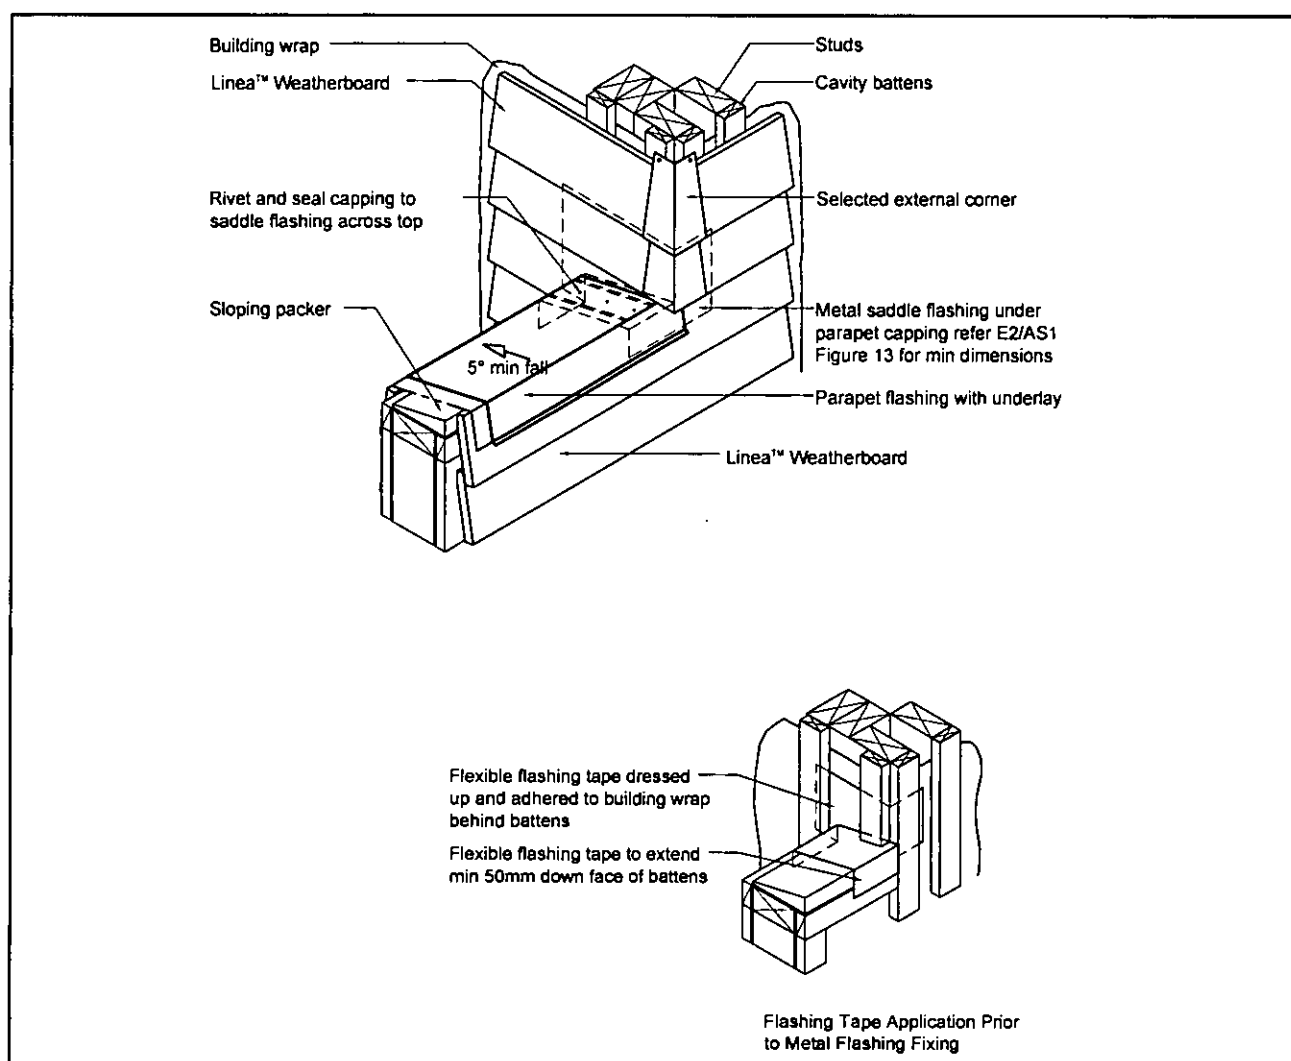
CAVITY ENCLOSED BALUSTRADE TO WALL
